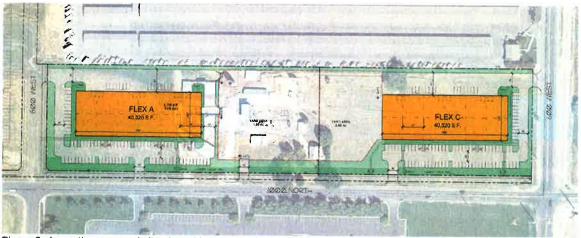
shows the proposed site plan with the outdoor storage areas in between.
